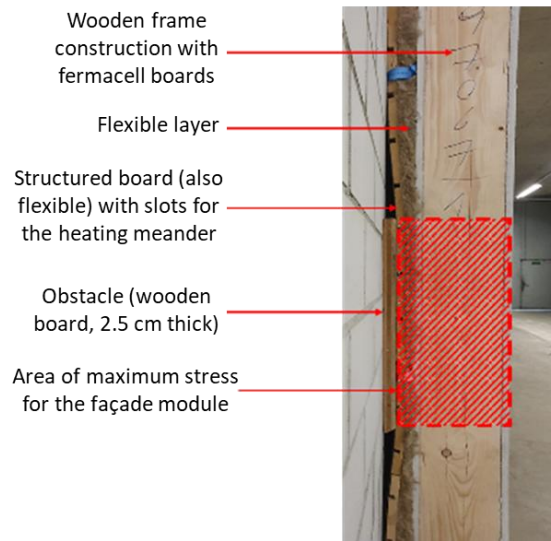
SIDE VIEW ON THE FAÇADE ELEMENT. AN OBSTACLE IS PUT BETWEEN WALL AND MODULE TO SEE ITS BEHAVIOR AND THE WORKING PRINCIPLE OF THE FLEXIBLE LAYER
